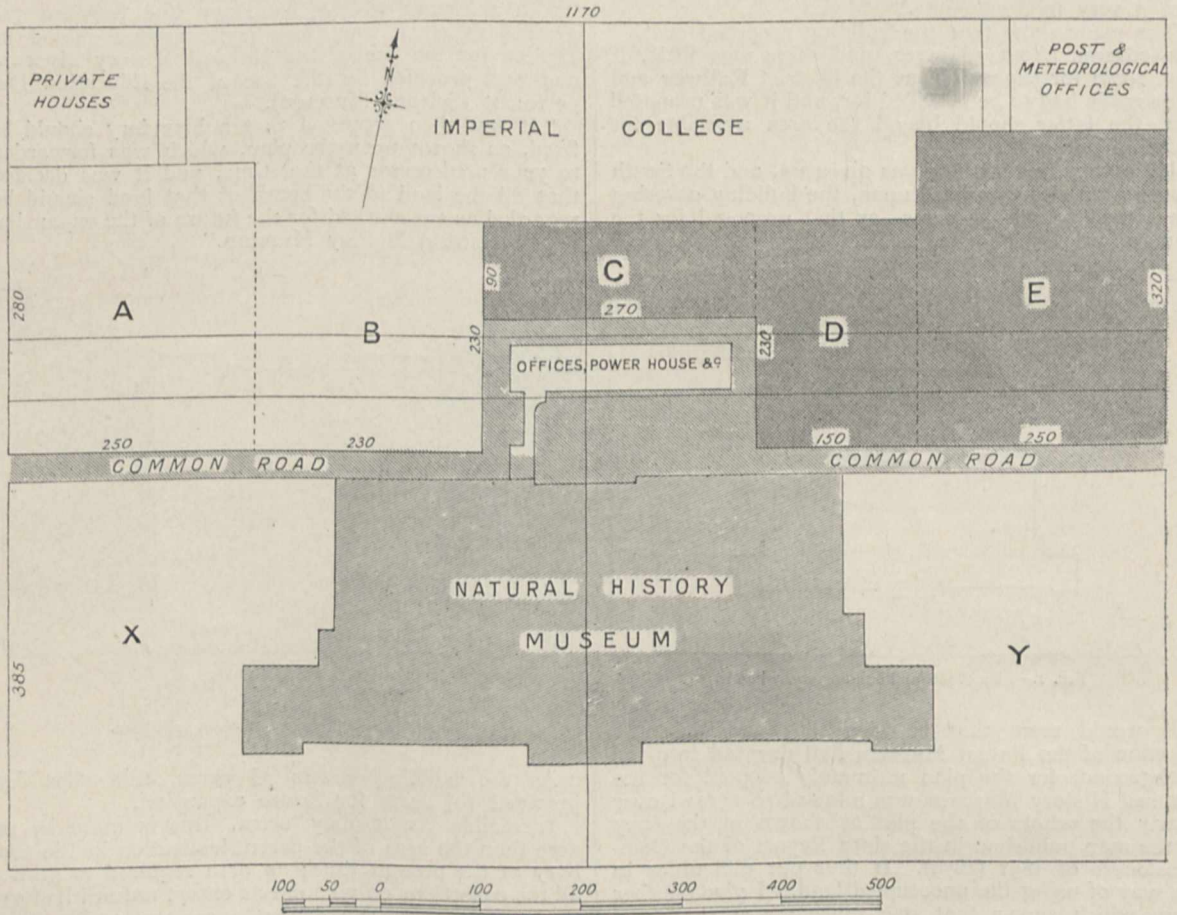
Plan showing utilisation of the existing road and spirit museum building.
